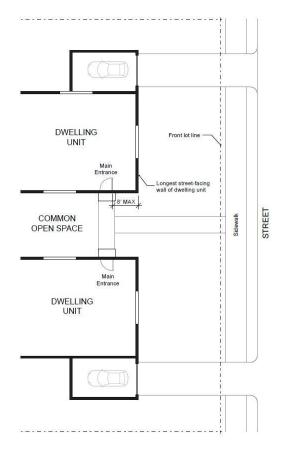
d. Main Entrance Facing Common Open Space
